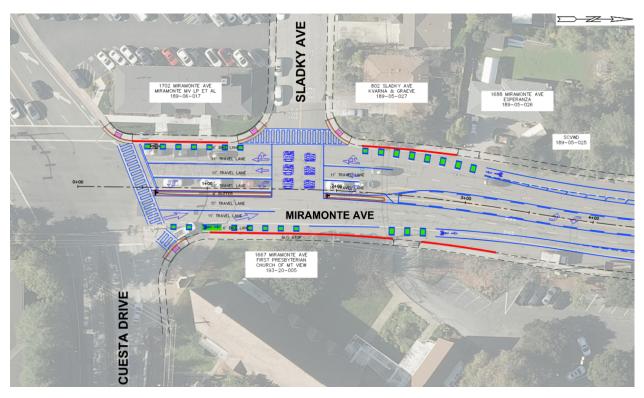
Cuesta Drive and Sladky Avenue Intersections
